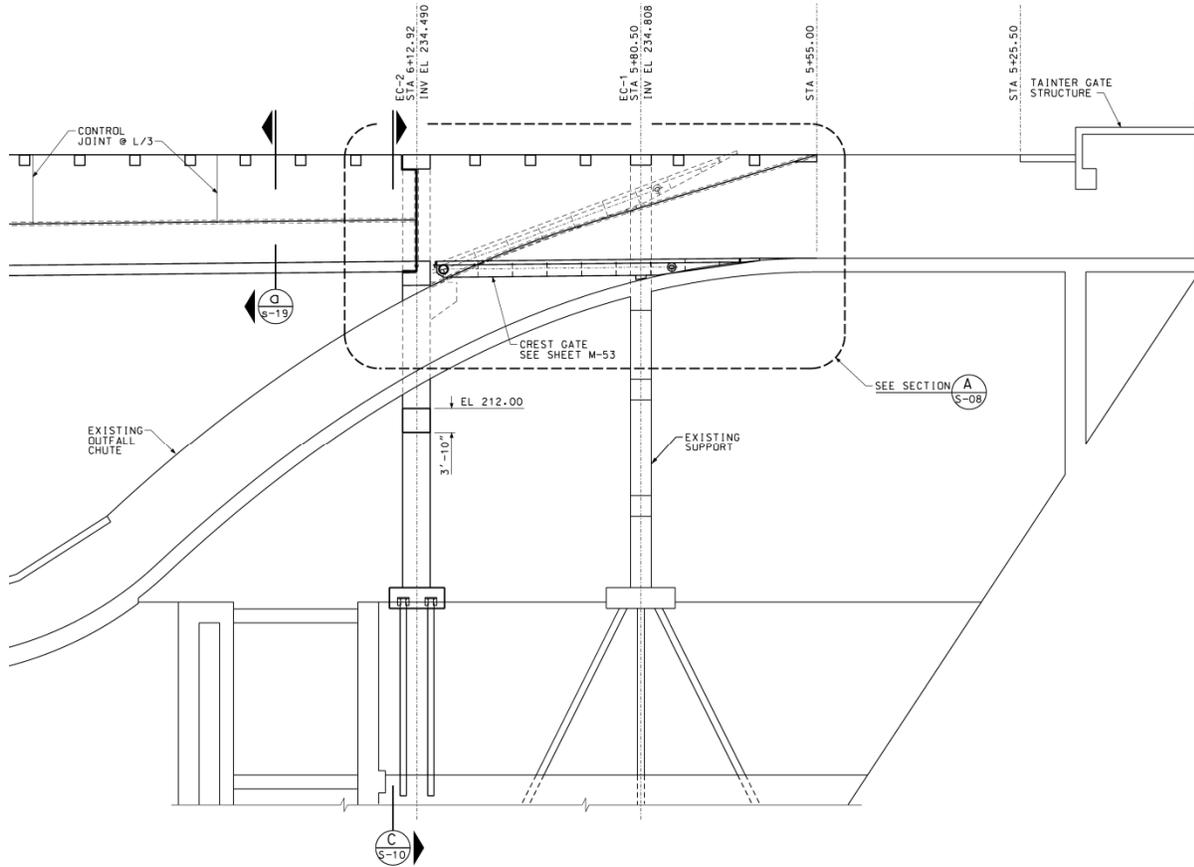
Elevation of Chute Foundation System and SFL, JDF 2-10/17
